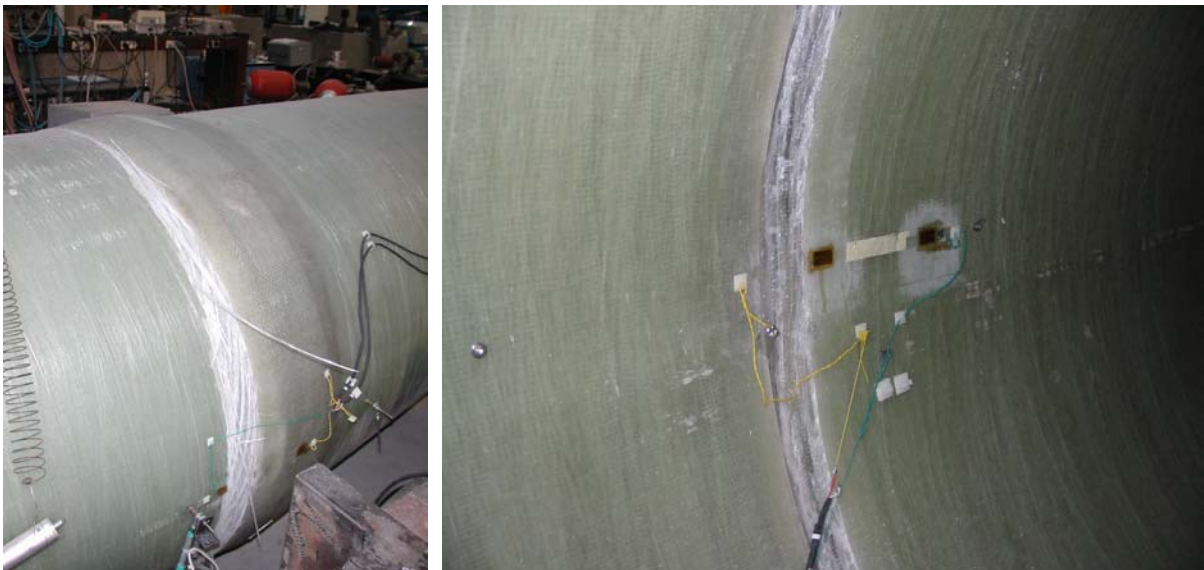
Detail of intermediate joint failure from outside (left) and inside (right) tube.
